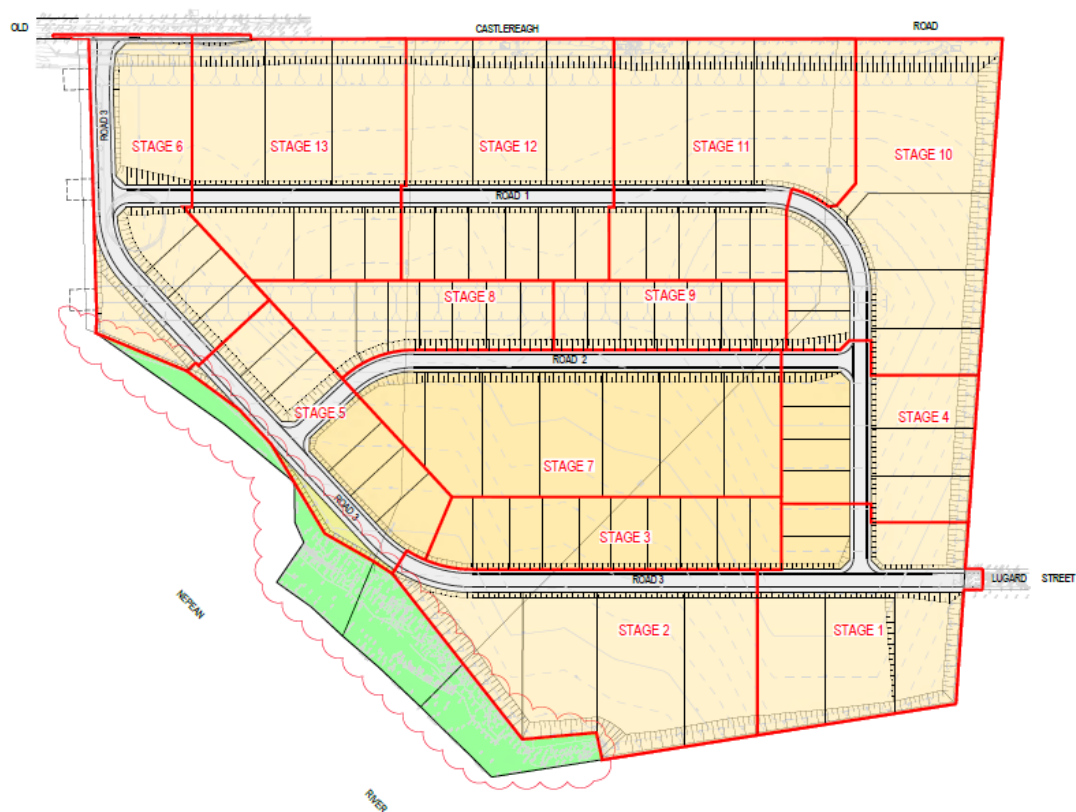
| Approved Community Title Subdivision (Source: DA9876 Stamped Plans)
